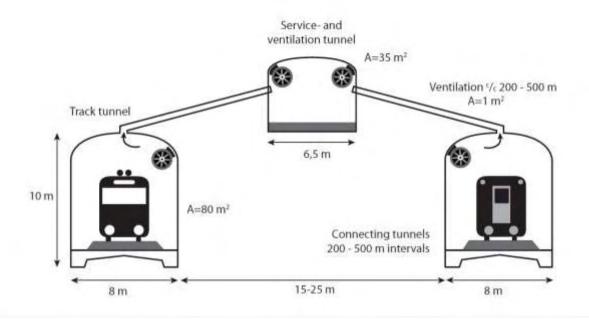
Submitted cross-section of the rock tunnel under the sea [4].
